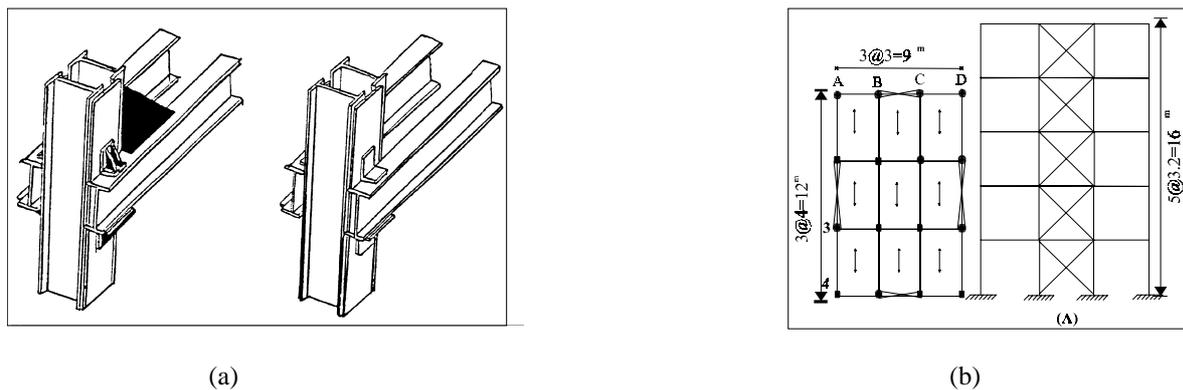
Plan and elevation of the braced frame model and typical shape of a khorjinee connection
